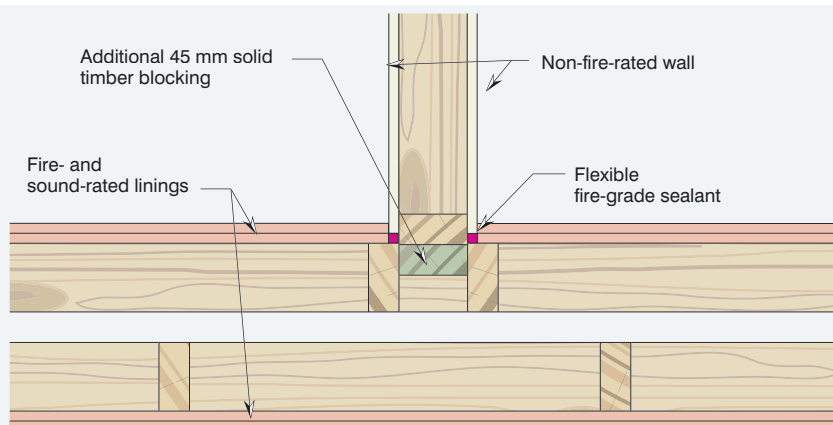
Non-fire-rated wall abutting 60 minute fire-rated walls using timber blocks – plan view.
